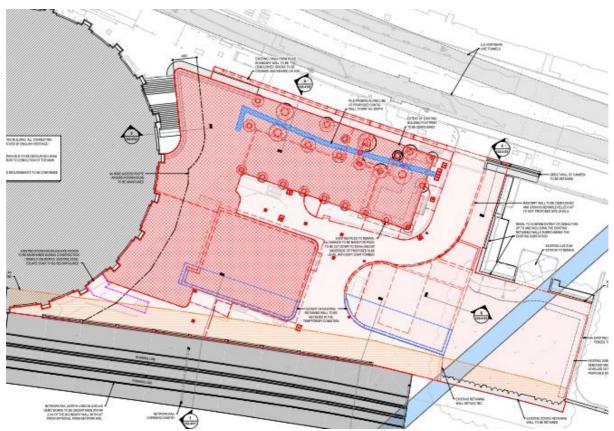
Site Plan – North London Line on Southern Boundary (bottom of plan), TWUL's Lee Tunnel (Blue, right of plan), Roundhouse on Western Boundary (left), LUL Tunnels to North
